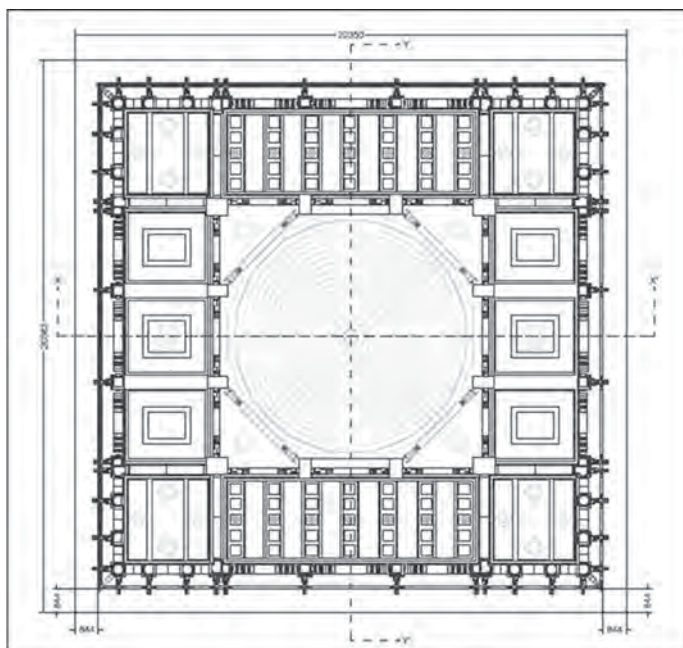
Reflected ceiling plan of Chhoti Dargah
